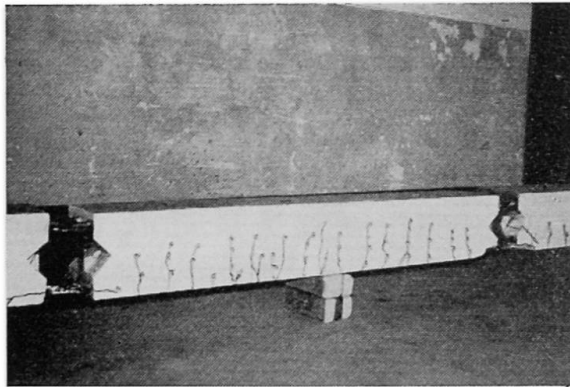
A beam made as shown in Fig. 4 after the test. The safety factor figured on the design load was 1.5, on the building load about 3.
